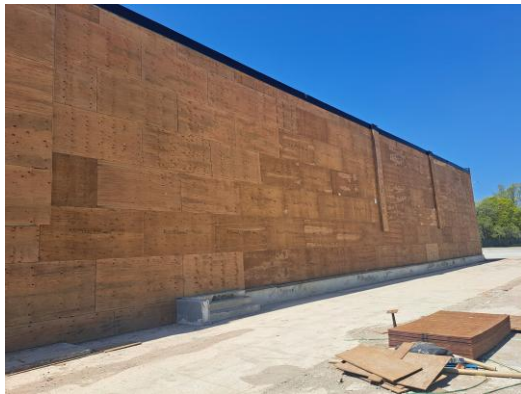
Quote for anti-graffiti painting on the installed pressure treated plywood along east and north side of part 1 building is to be reviewed by Metrolinx for further instruction.
